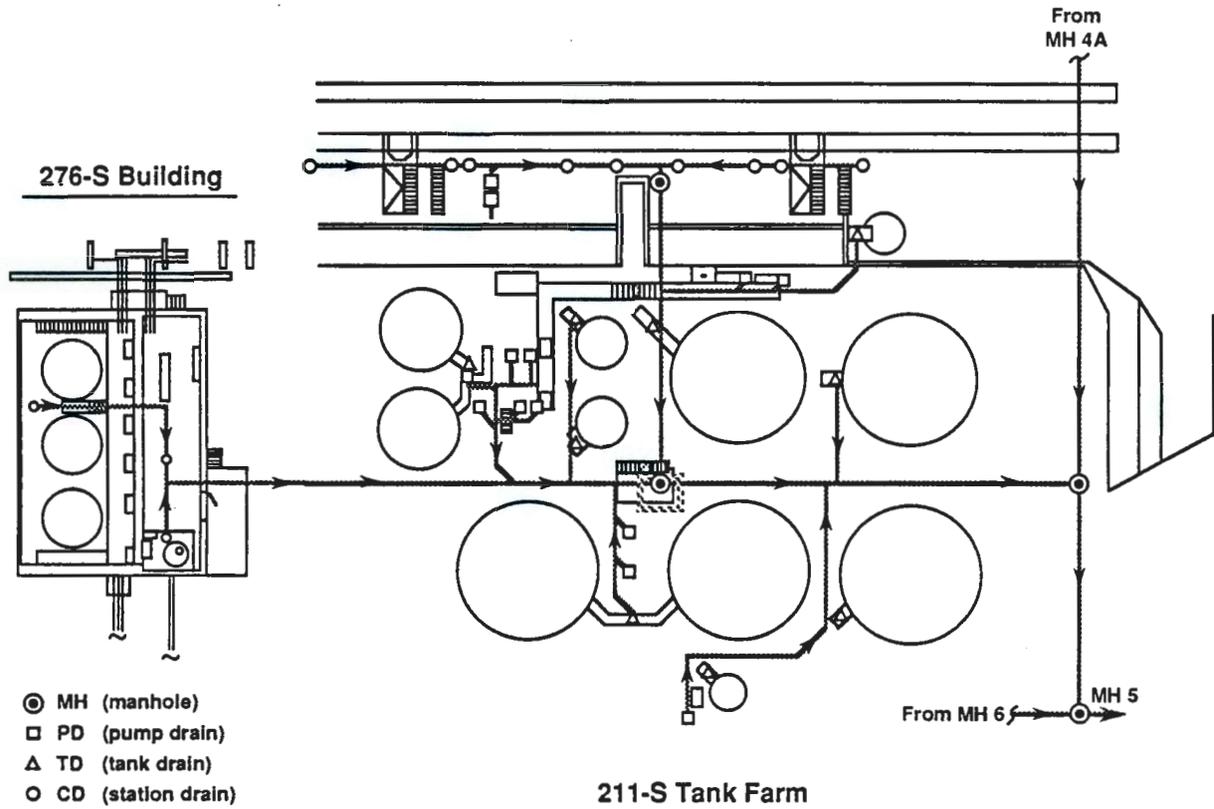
Floorplan and Piping Diagram for the 211-S Tank Farm and 276-S Hexone Cold Storage Building.
